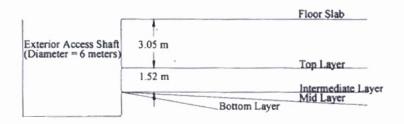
Elevation View of Sleeve Pipe array from one shaft.
